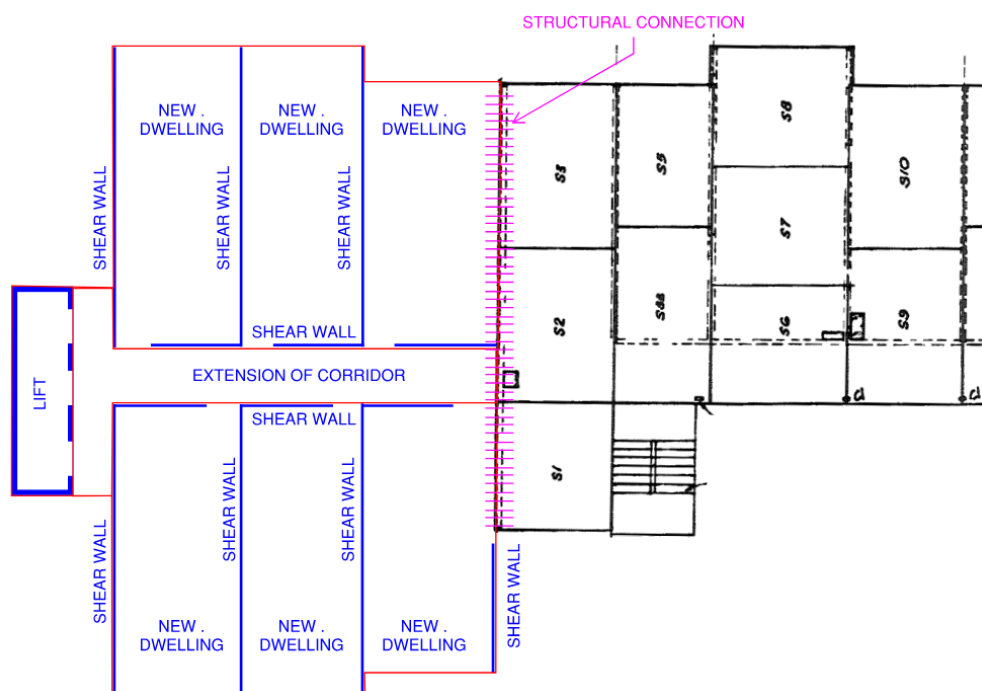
Hypothetical plan arrangement at western wing of building indicating possible new dwellings and lift shaft and associated new additional structural shear wall elements.
